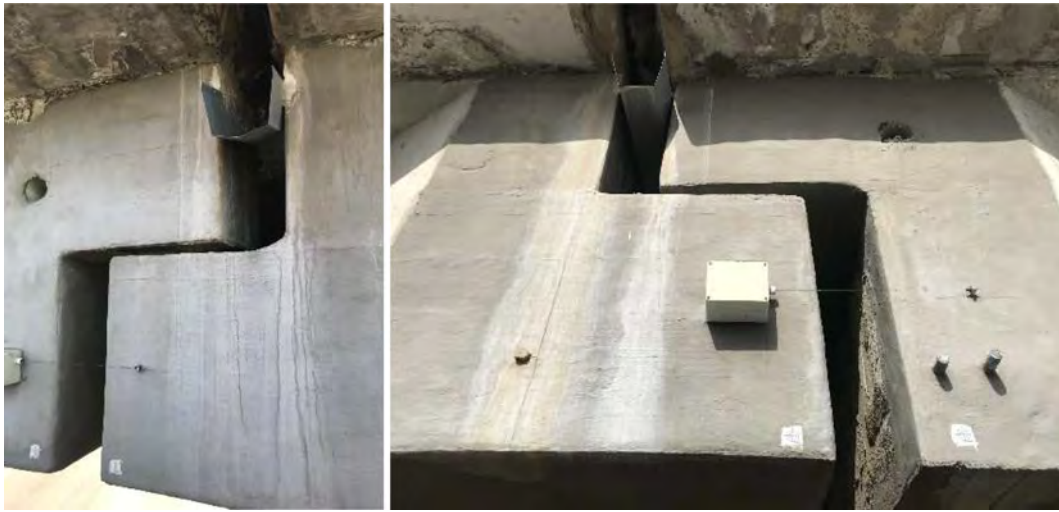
Concrete jacking of Gerber saddle with CFRP fabrics
